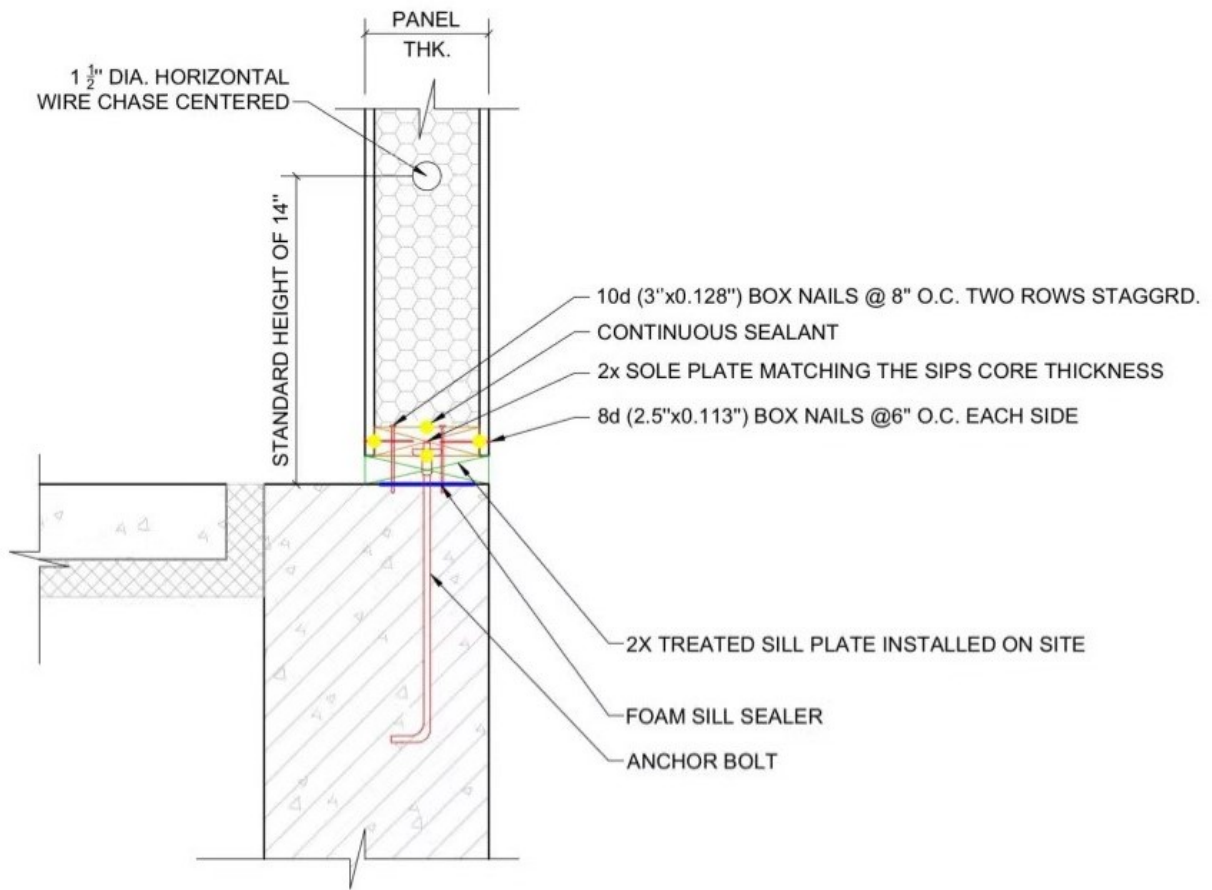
TYPICAL WALL PANEL ON FOUNDATION
